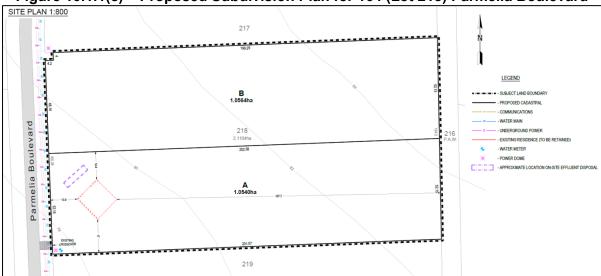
(c) - Proposed Subdivision Plan for 164 (Lot 218) Parmelia Boulevard
